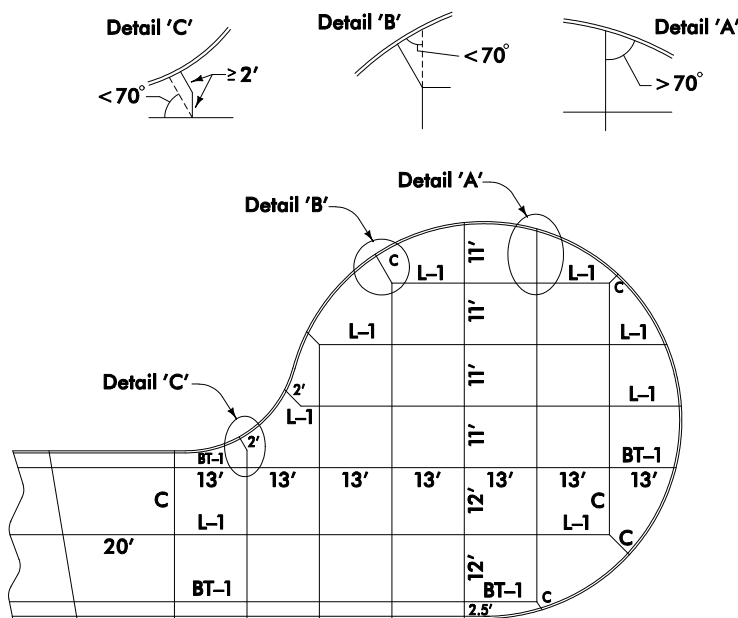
G-3.13: Final Jointing Layout - Gutterline Jointing Examples
